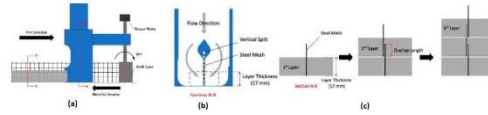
Vertical steel wire mesh reinforcement for printed concrete involves: (a) the placement of vertical steel mesh reinforcement, (b) the cross-sectional design of the nozzle head used for concrete deposition, and (c) the overlap of vertical steel mesh between successive printed layers.
